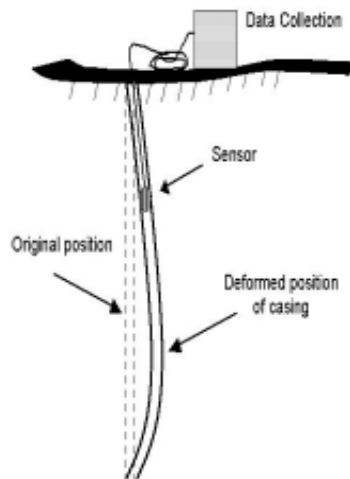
Cross-sectional schematic of typical traverse-probe inclinometer system.
